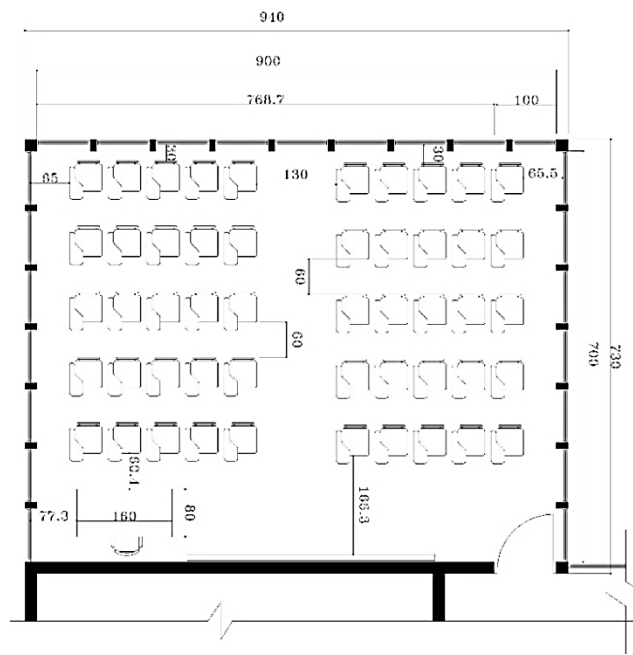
Classrooms Type-C Interior Furniture Arrangement in the Techno Park Building
